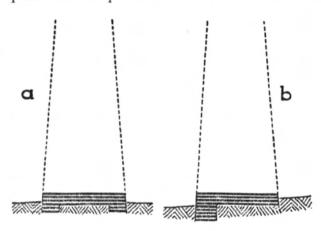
Scheme To Show Construction of Foundations of Wide Brick Walls
